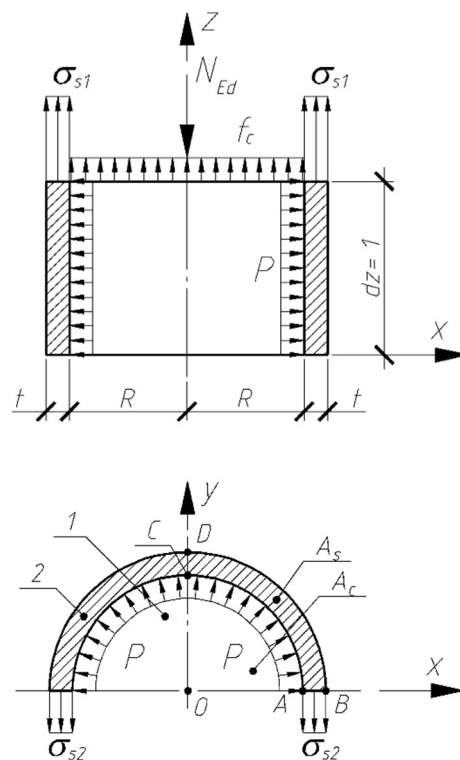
Design diagram of concrete-filled steel tubular member deformation mode:
